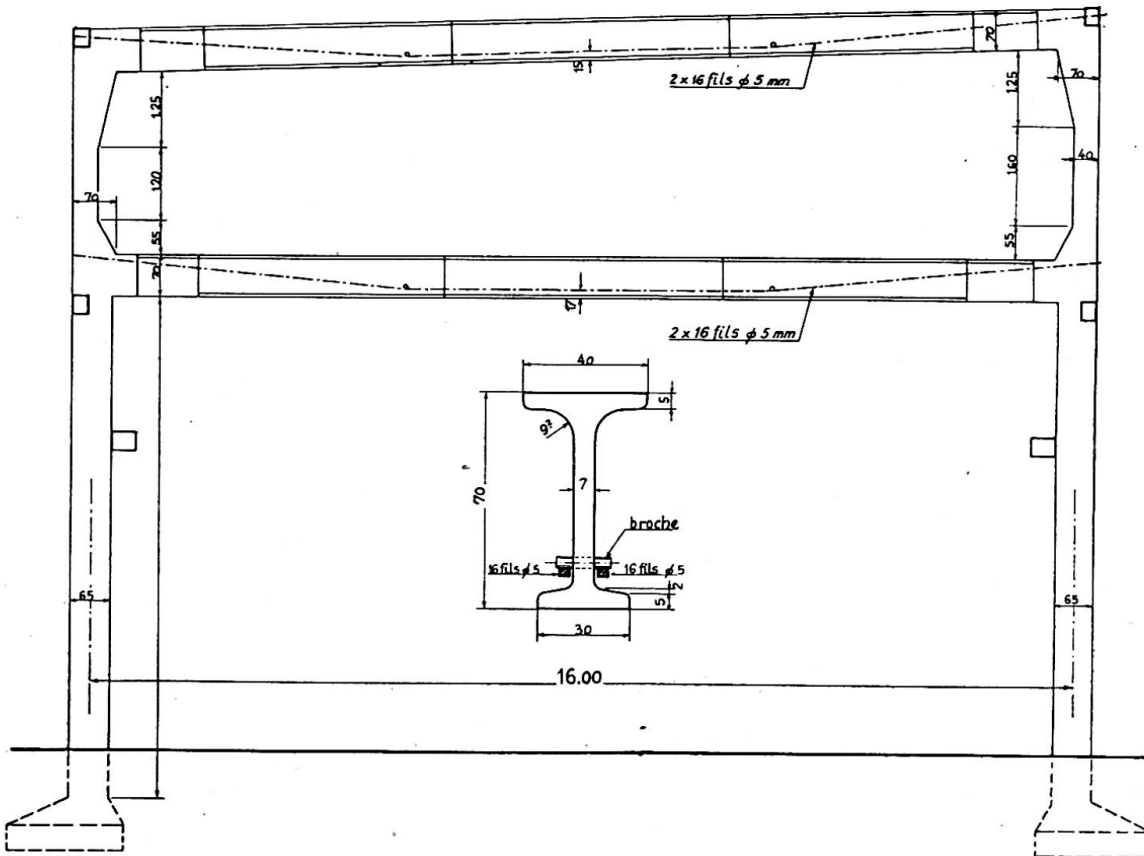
Factory at Machelen. Dépôt—Cross-section
